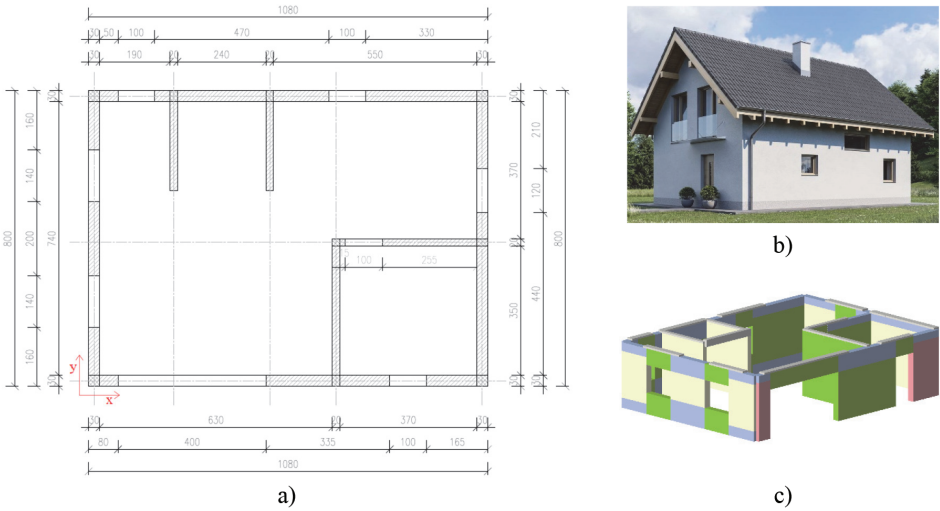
Ground floor plan (a), 3D view (b) [11] and 3MURI structural numerical model (c) of the considered typical detached family house
